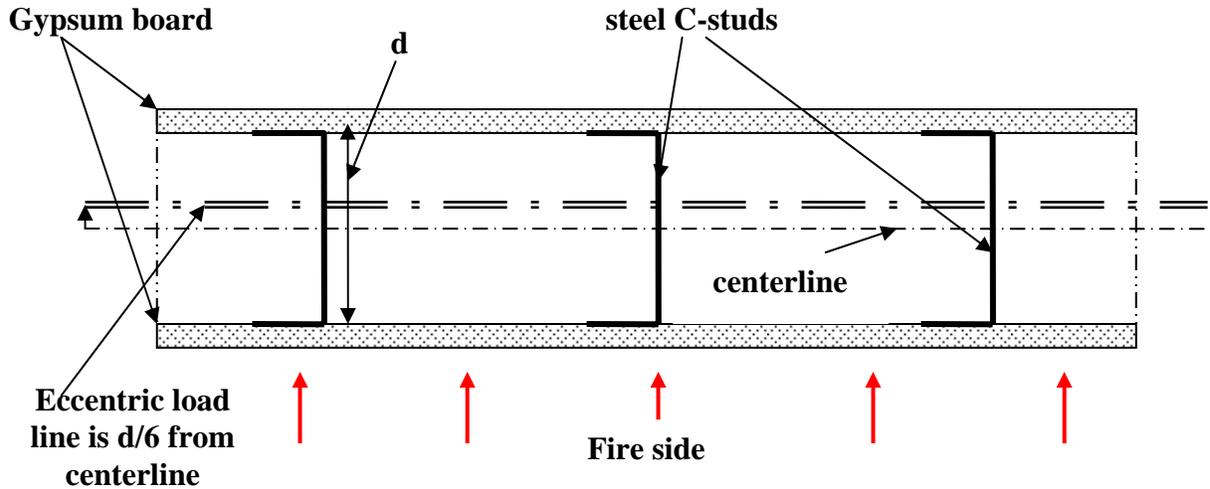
Cross-section of Proposed Wall Assembly, including Eccentric Load Line (away from fireside for steel studs only) – (cavity insulation not shown).
